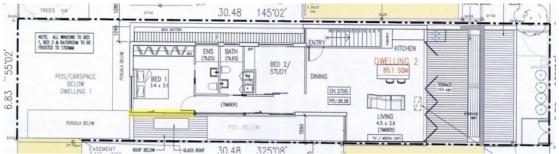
Yellow highlight showing location of west-facing habitable room windows at first floor of No. 108 Queens Parade (PLN11/0937 Endorsed Plans)
